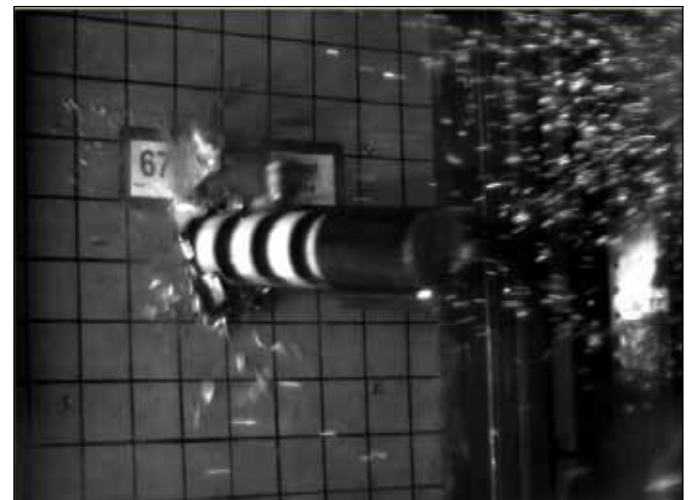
Soft missile impact on reinforced concrete slab (VTT)
